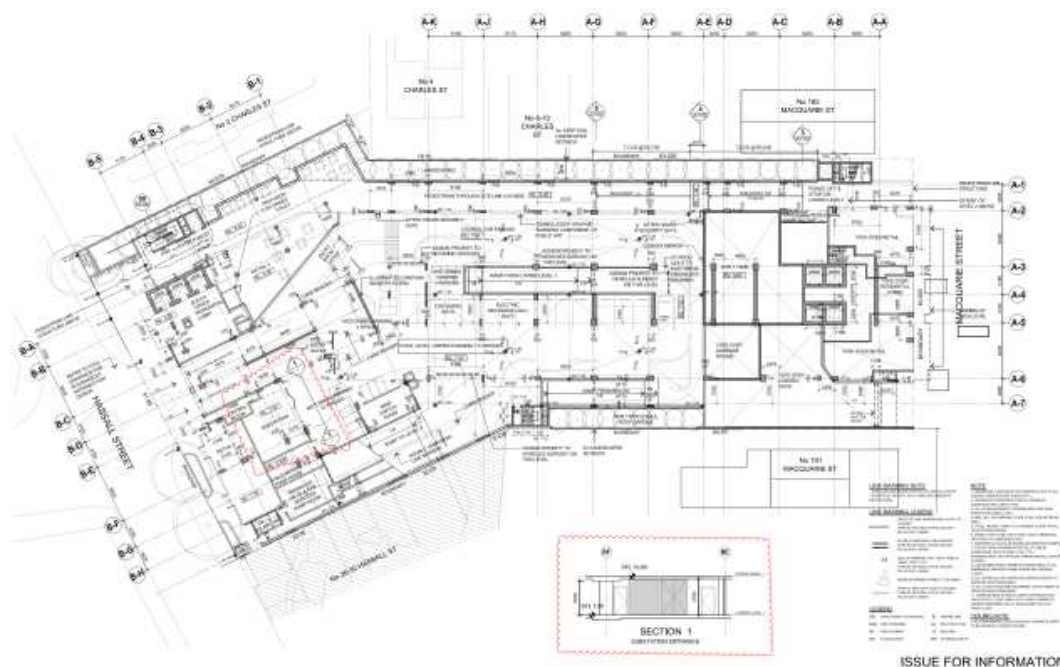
Proposed Amended Upper Level 1 Floor Plan (Council Car Park) (Source: KTA, 2015)
